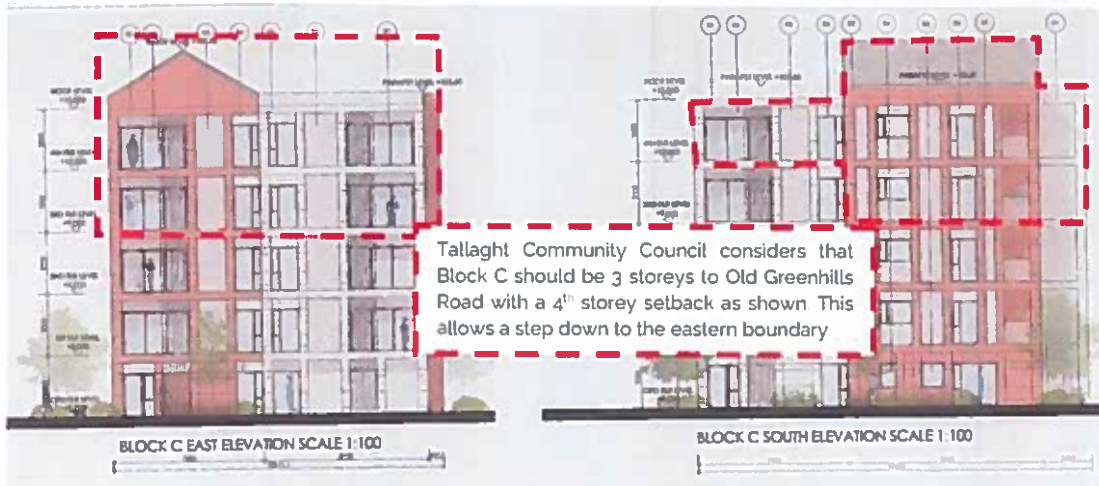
Block C's south and east elevations to adjoin Old Greenhills Road
